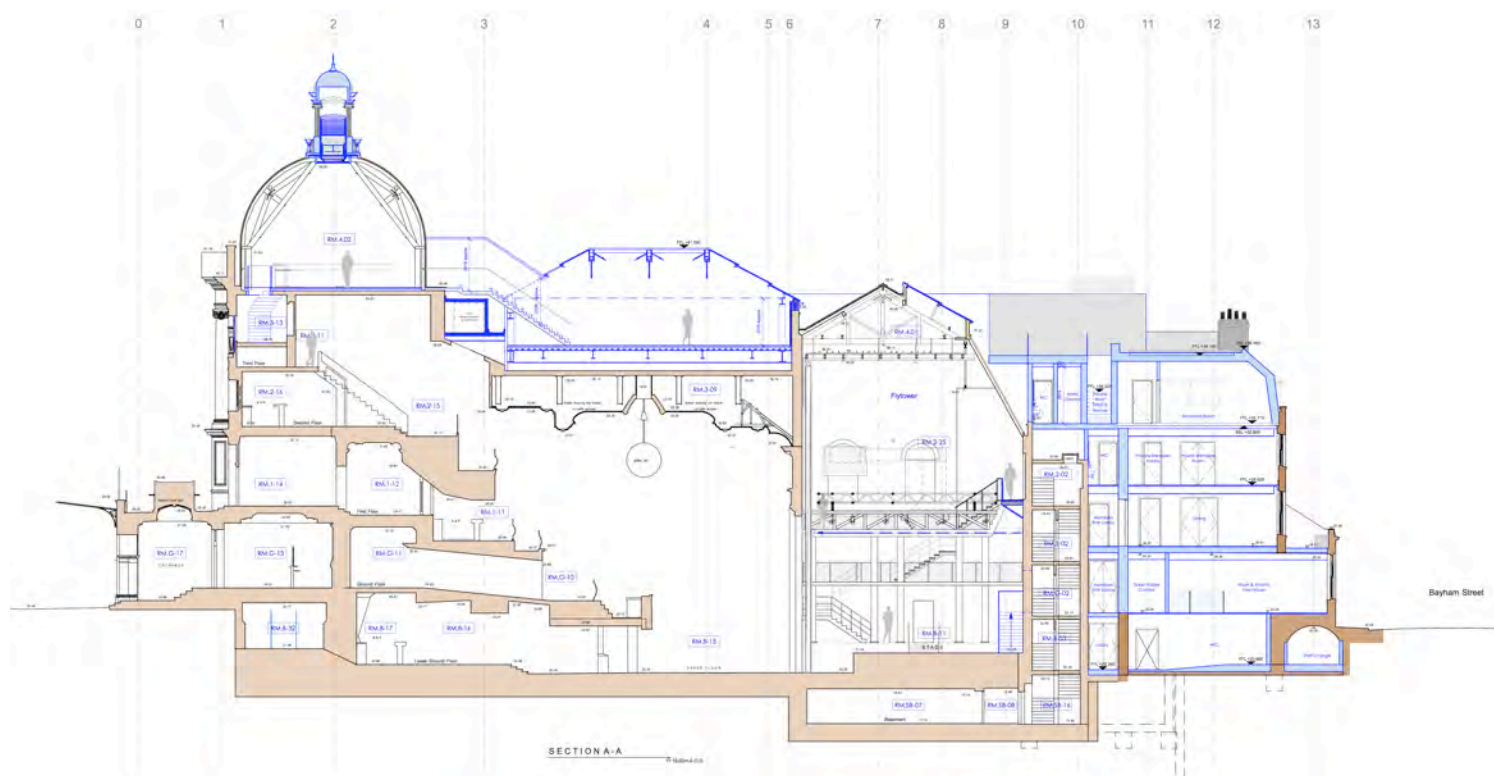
Proposed section AA through the dome, rooftop lobby, flytower and the Hope & Anchor.
